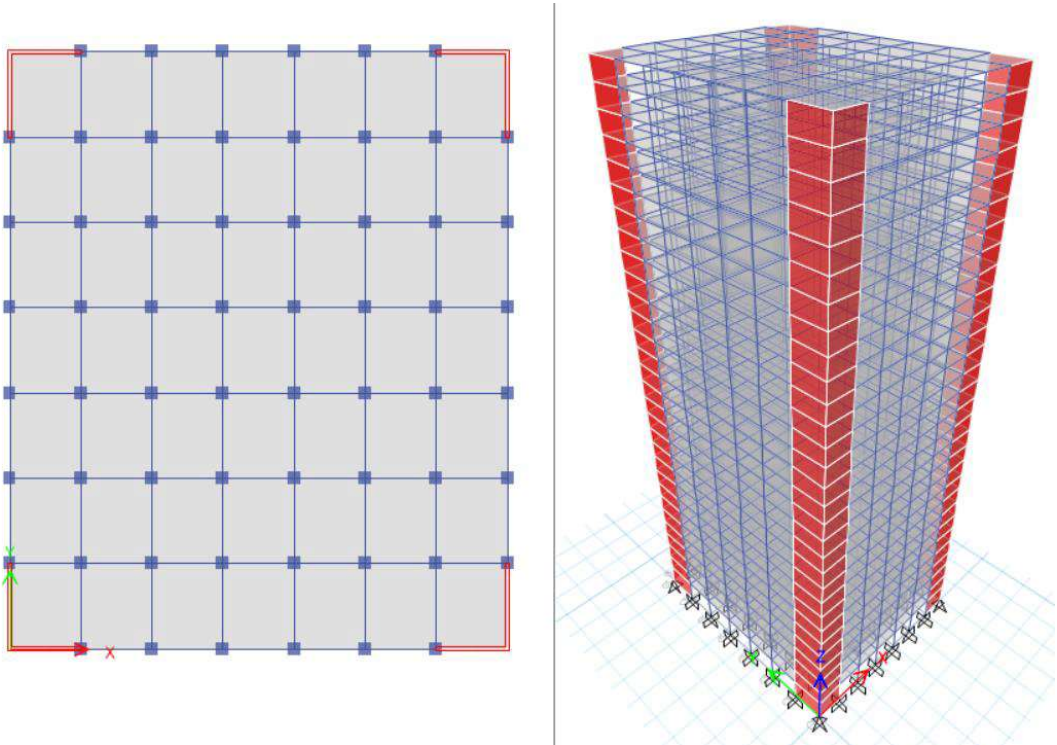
6 Structural Plan and Elevation Views of Case II Model
